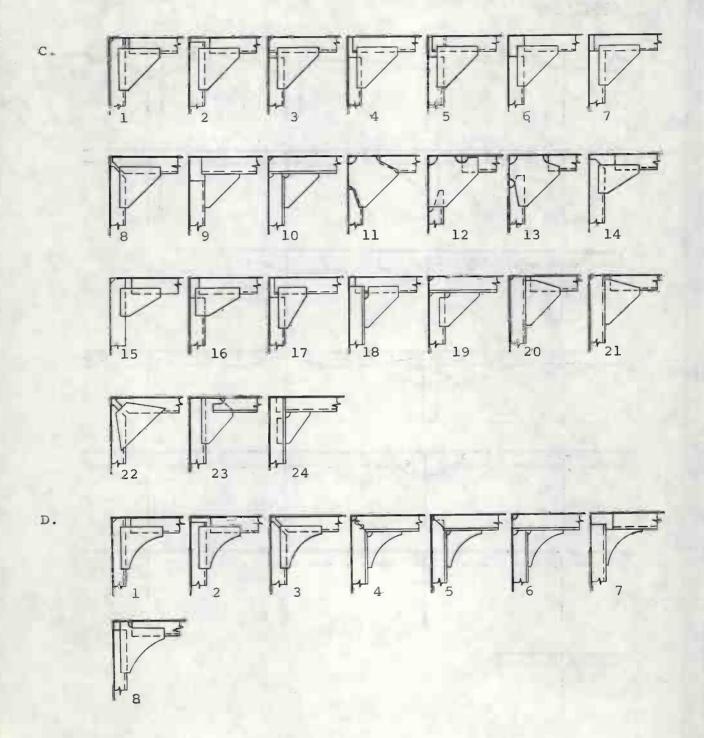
BEAM BRACKETS DETAILS, Family No. 1 (Cont'd)
